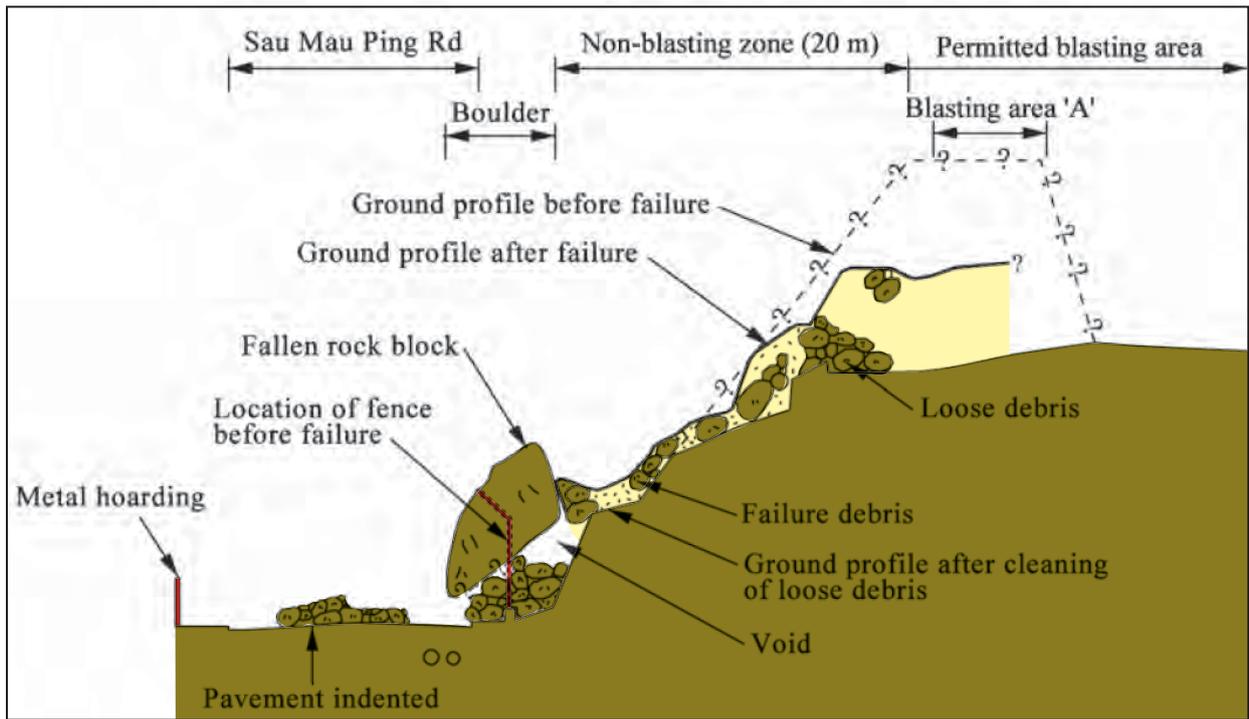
Section through the blast-induced failure at Sau Mau Ping Road (Leung et al., 1999)
